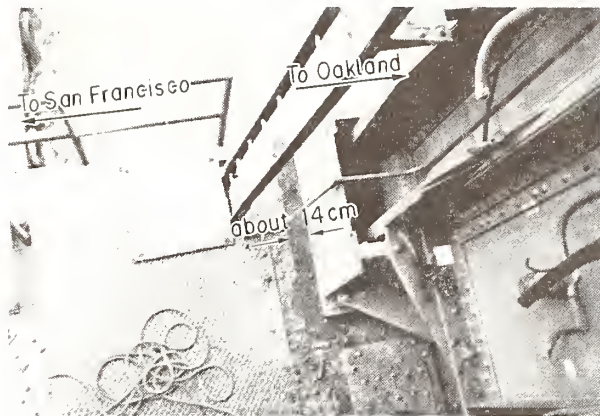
Movement of the fixed bearing support on the east (Oakland) side of pier E9. Bolts were shear off, and the support moved about 14 cm to Oakland side. Due to this movement the upper deck (with bearing seat length of 12.7cm) dislodged from the supports, and fell down (from CALTRANS).
